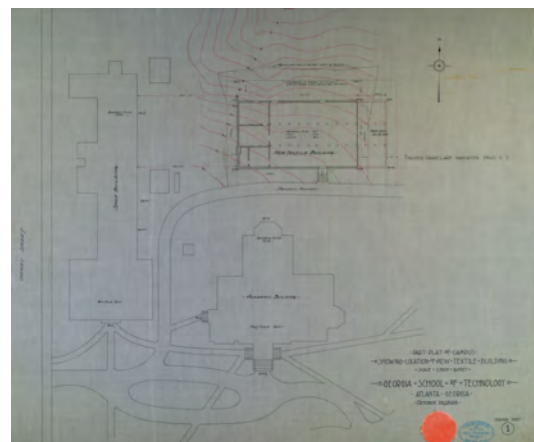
Lockwood, Greene & Company Campus Plan, 1898. Georgia Tech Library, Architecture and Design Archives and Special Collections, Splendid Growth: Architectural Drawings of the A. French Textile Building (Exhibit)
